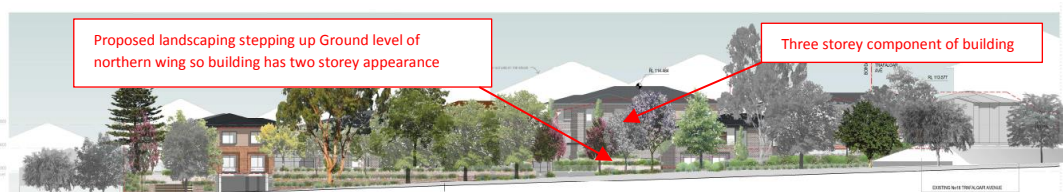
Streetscape Elevation (North East) with existing and proposed planting. Source-Group GSA
